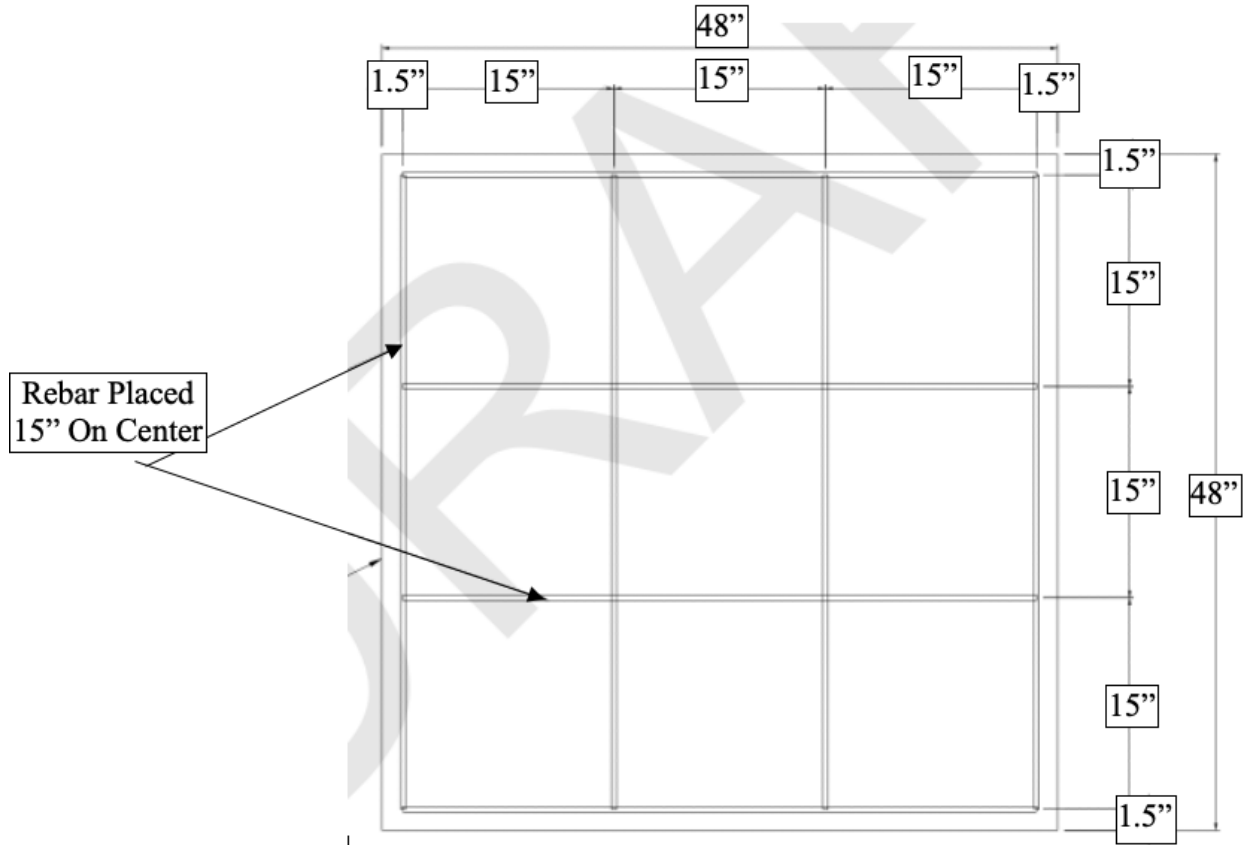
Plan view of concrete pad used for supporting tank. See appendix L for more details.
